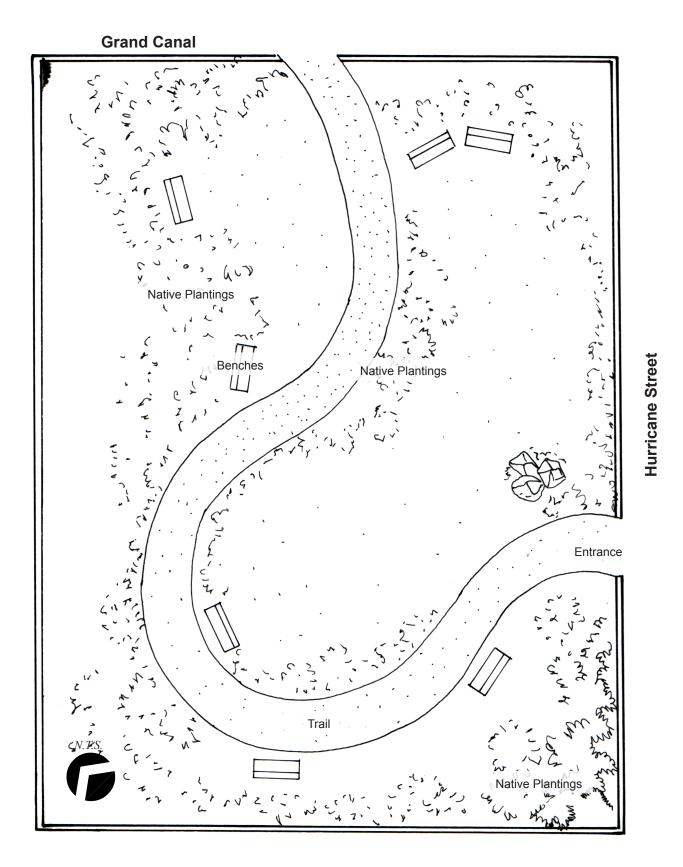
Plan view of proposed Hurricane Park - Alt 2
